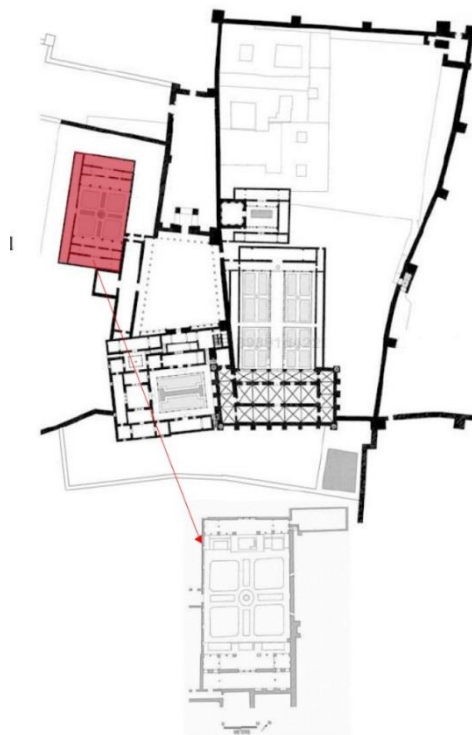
Top; Alcazar of Seville, showing the dominant layout of Chahar Bagh in the whole area, bottom; Plan of Casa de Contratacion (Ruggles 2011: 157)
